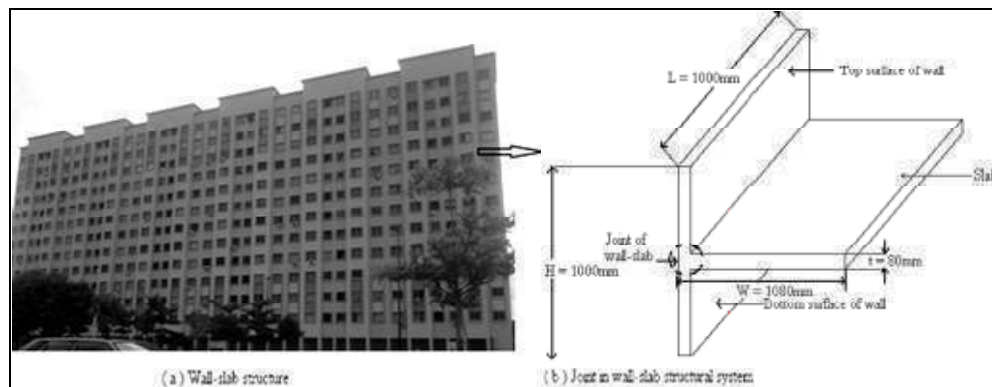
(a) Wall-slab structural system (b) Basic specimen design
